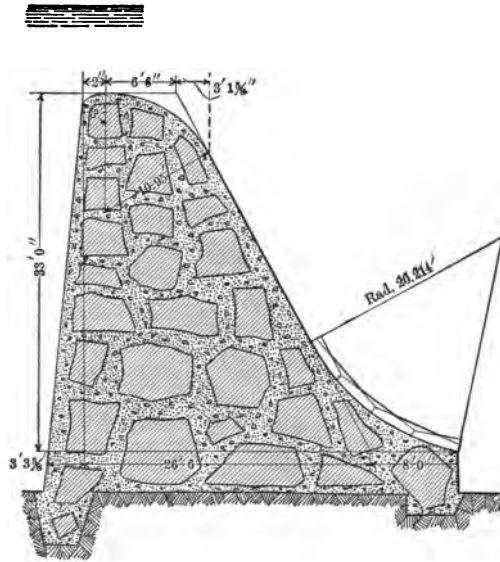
SECTION OF SPILLWAY OF MAIN DAM.
